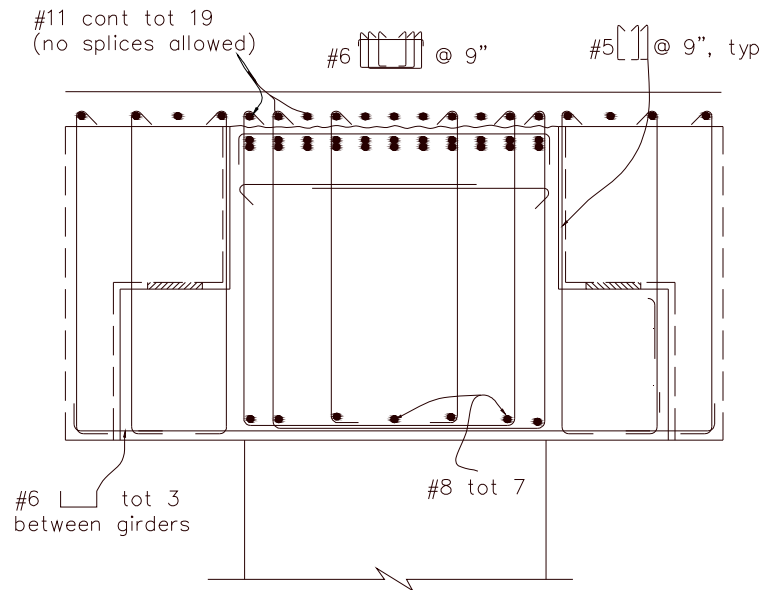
Cap Beam Reinforcement under Service Load Conditions
